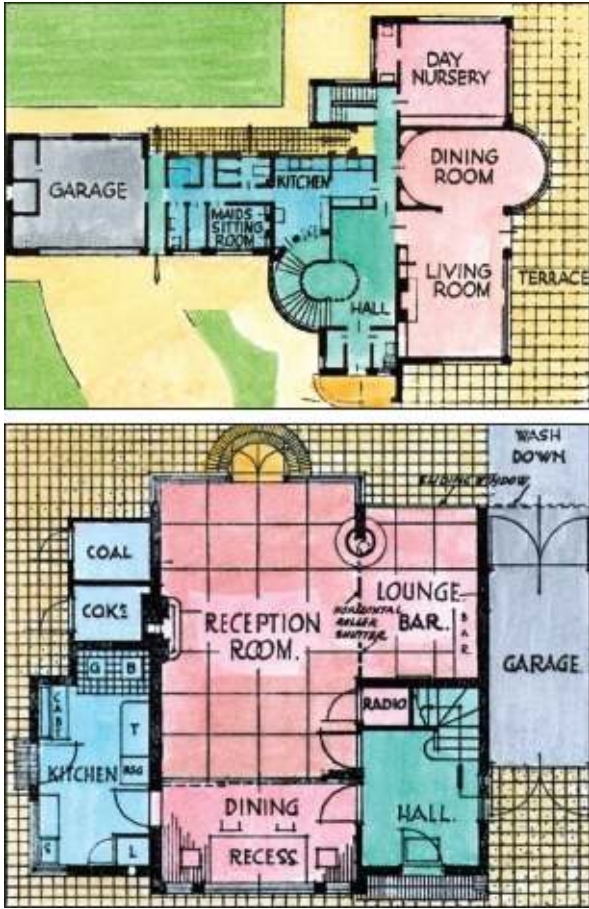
Two plans of modern houses from the mid 1930s, with elements of open planning between reception rooms and a garage
